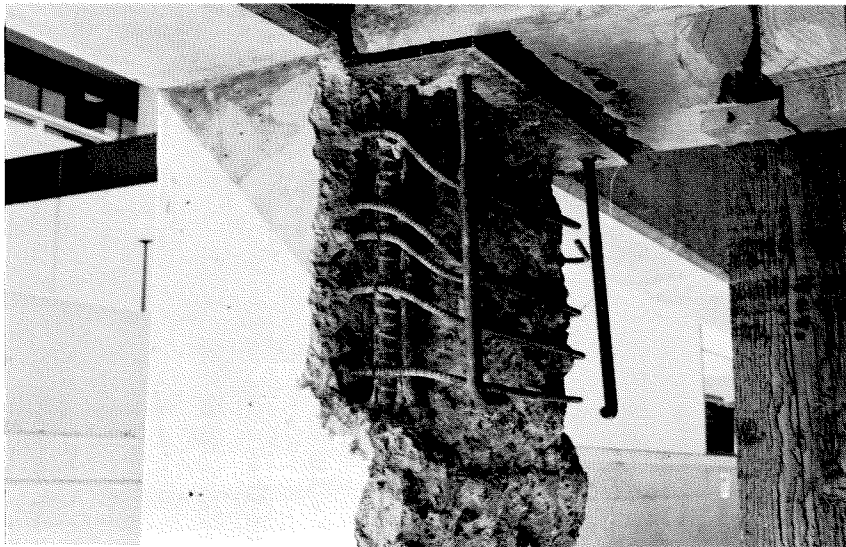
Concrete removed from the exterior column of the Union Bank parking structure to reveal the reinforcing steel.
